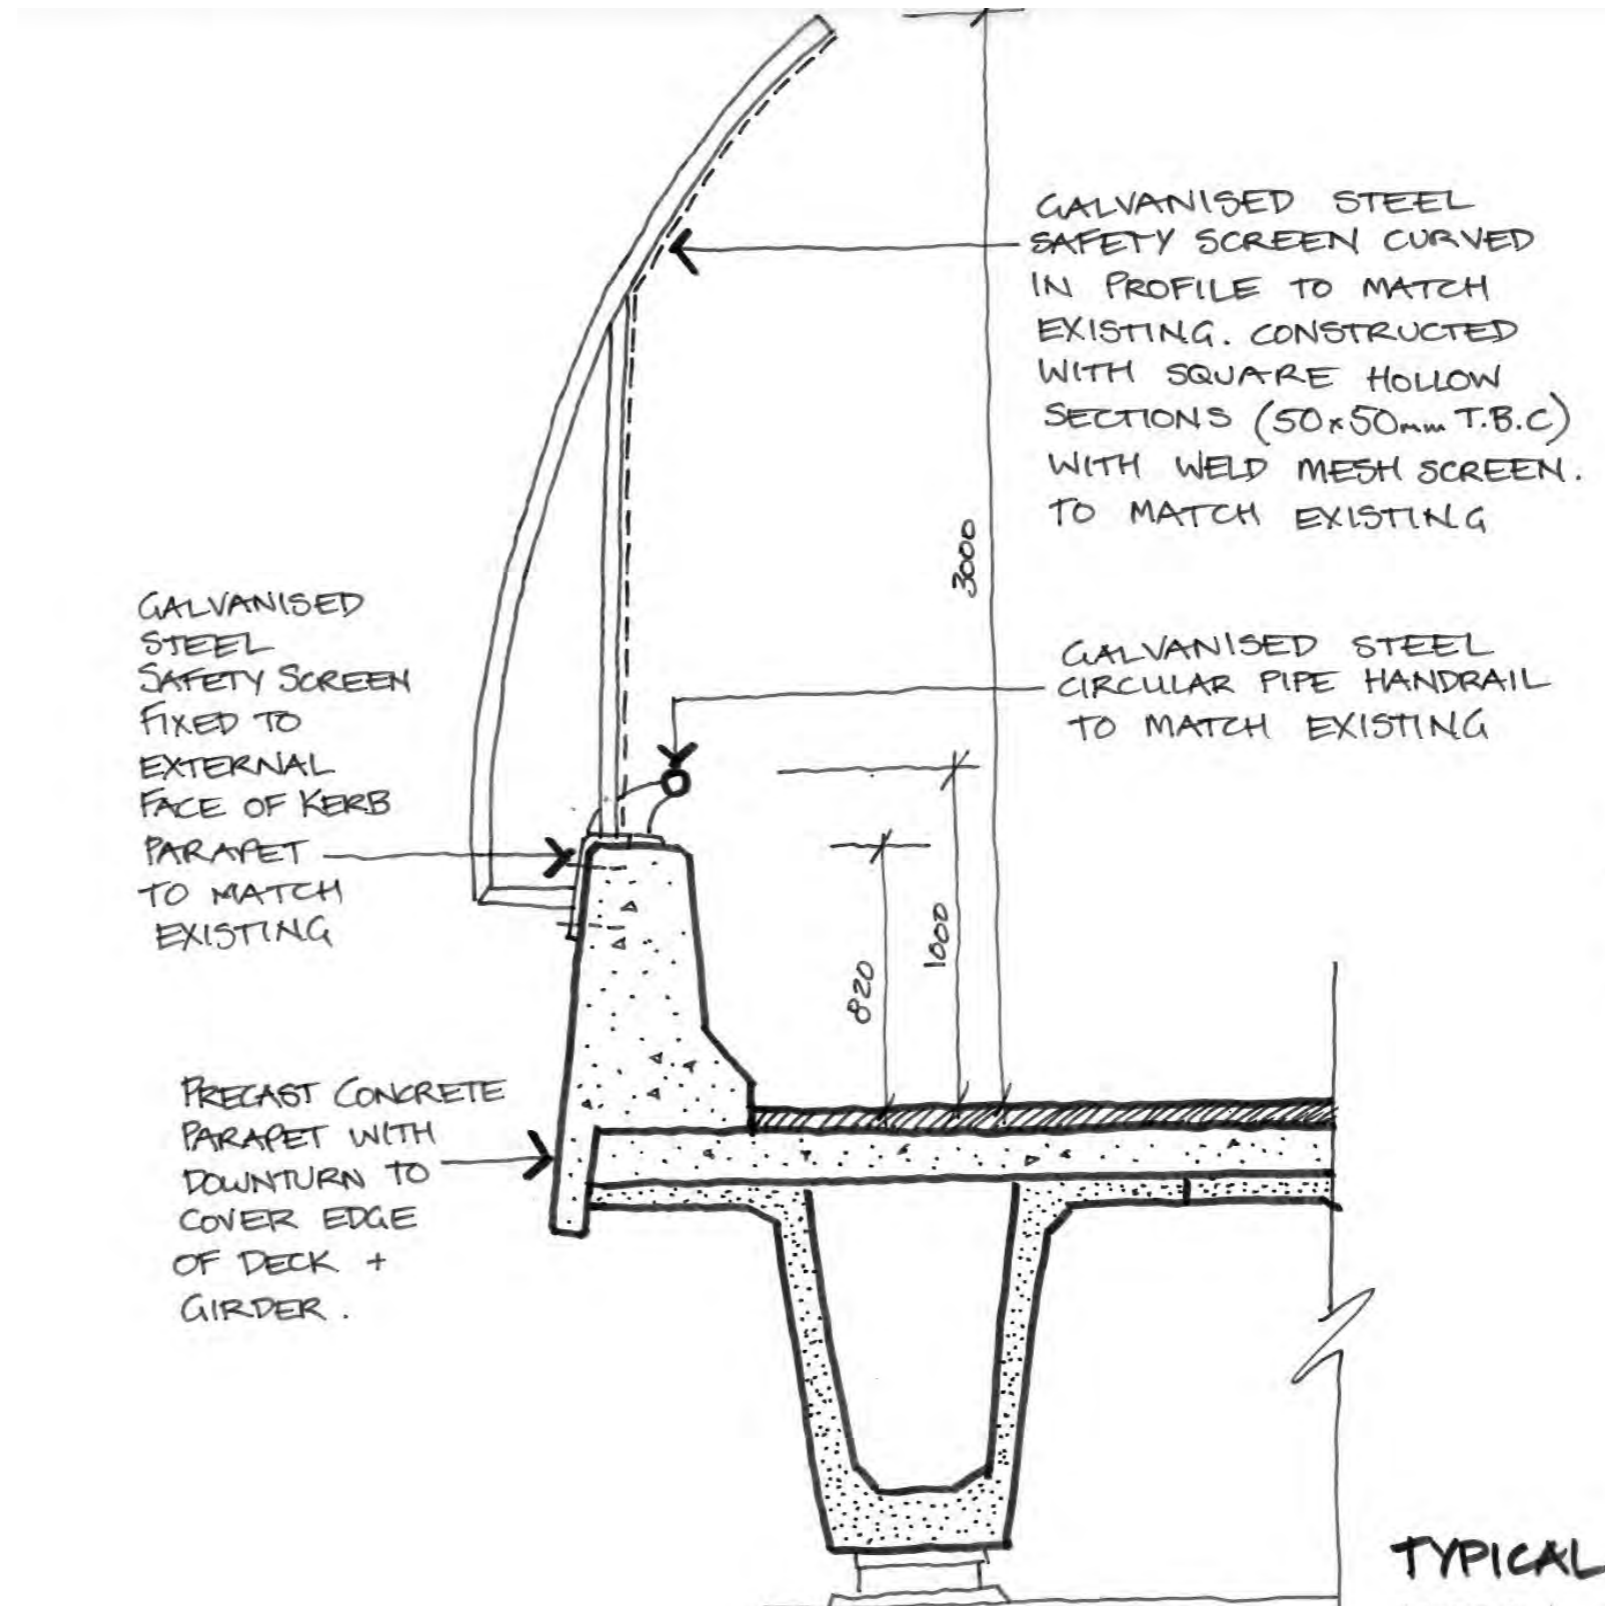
Typical Overbridge - Parapet detail on Barclay Road Bridge
